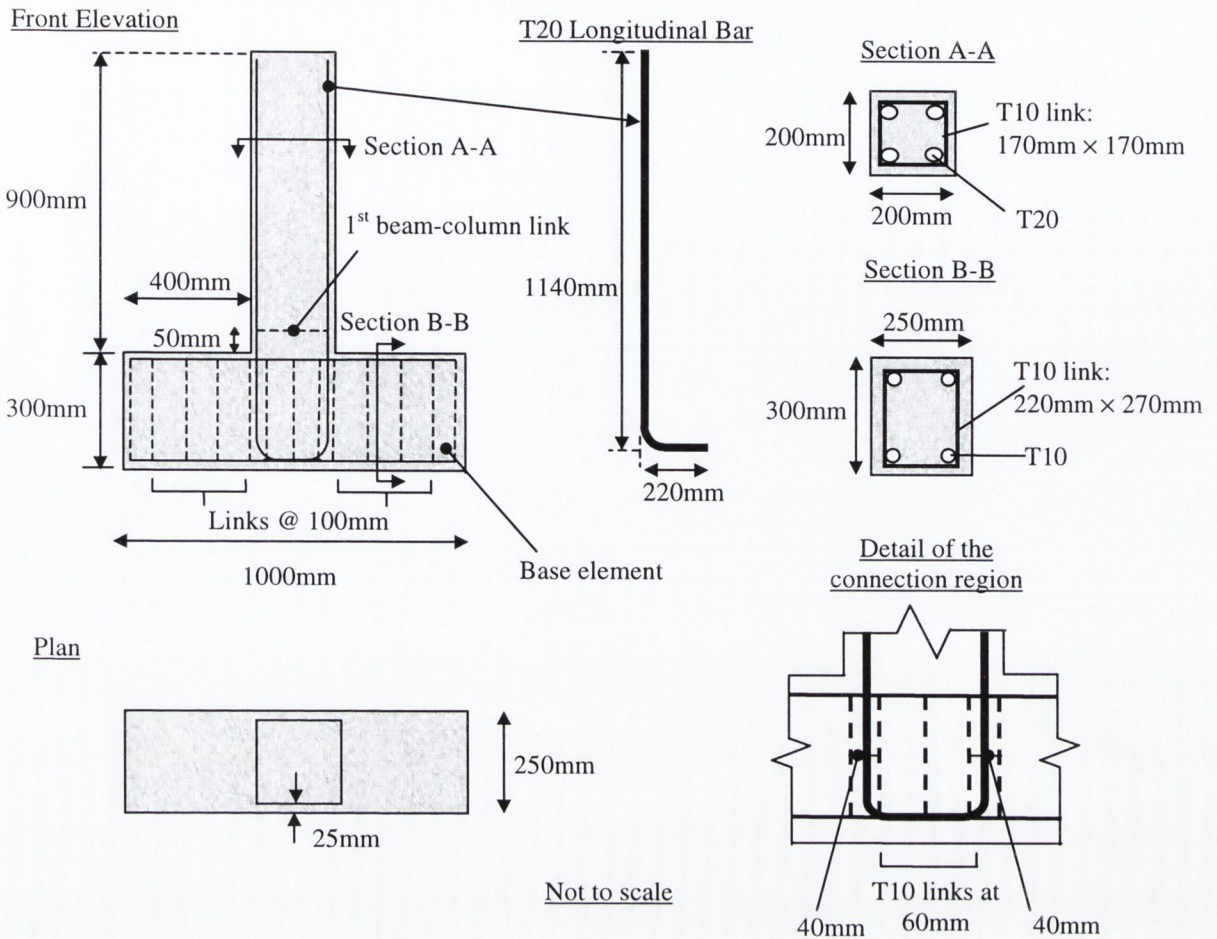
Beam-column dimensions and detailing (Test Series 6)
